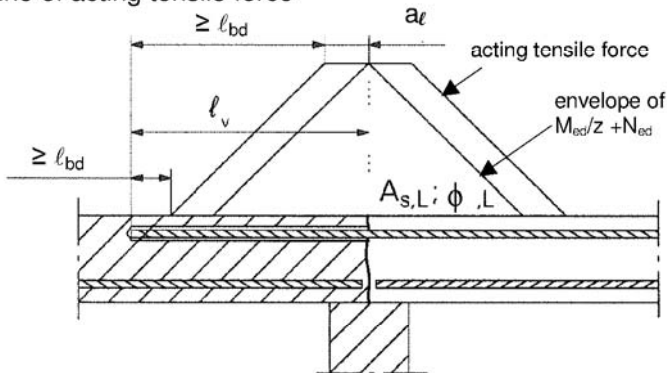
Overlapping joint at a foundation of a wall or column where the rebars are stressed in tension
